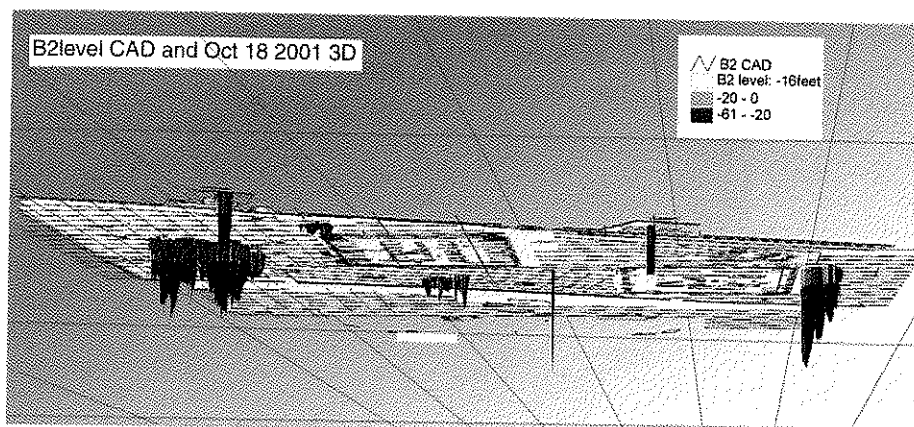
LIDAR elevations overlain with CAD-based building and room layout levels at the second level of basement, showing debris penetration.
